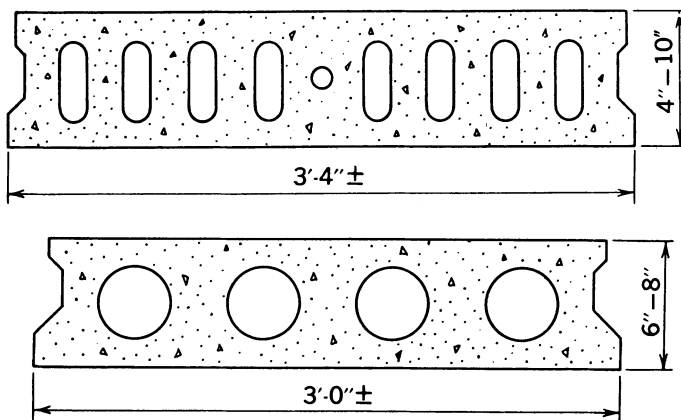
Typical sections of hollow slabs produced in the United States.
